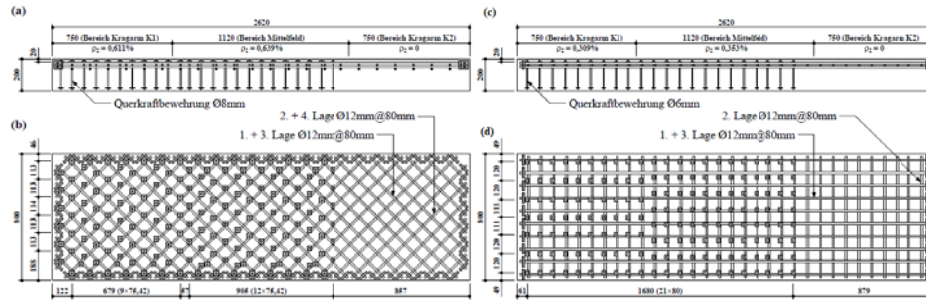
a) Longitudinal section of reinforcement of A1; b) Plan of reinforcement of slab A1; c) Longitudinal reinforcement of A3; d) Plan of reinforcement of A3, Jaeger (2005).
